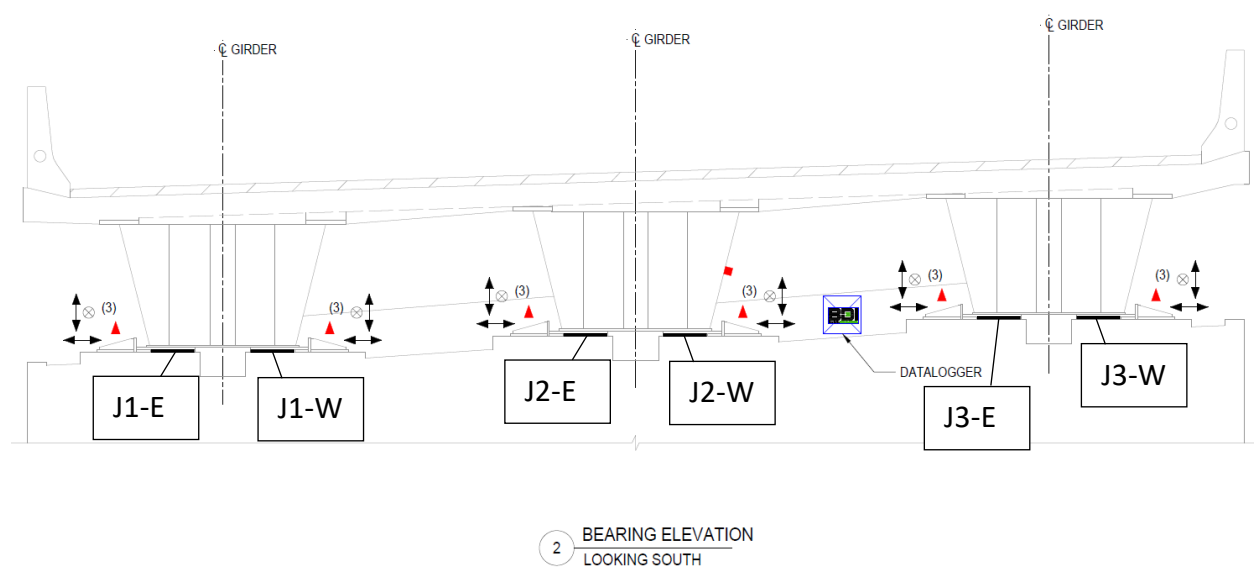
Bearing layout at Steeles Avenue as shown in first inspection report (“407W-to-427S Bridge”, 2020a)
